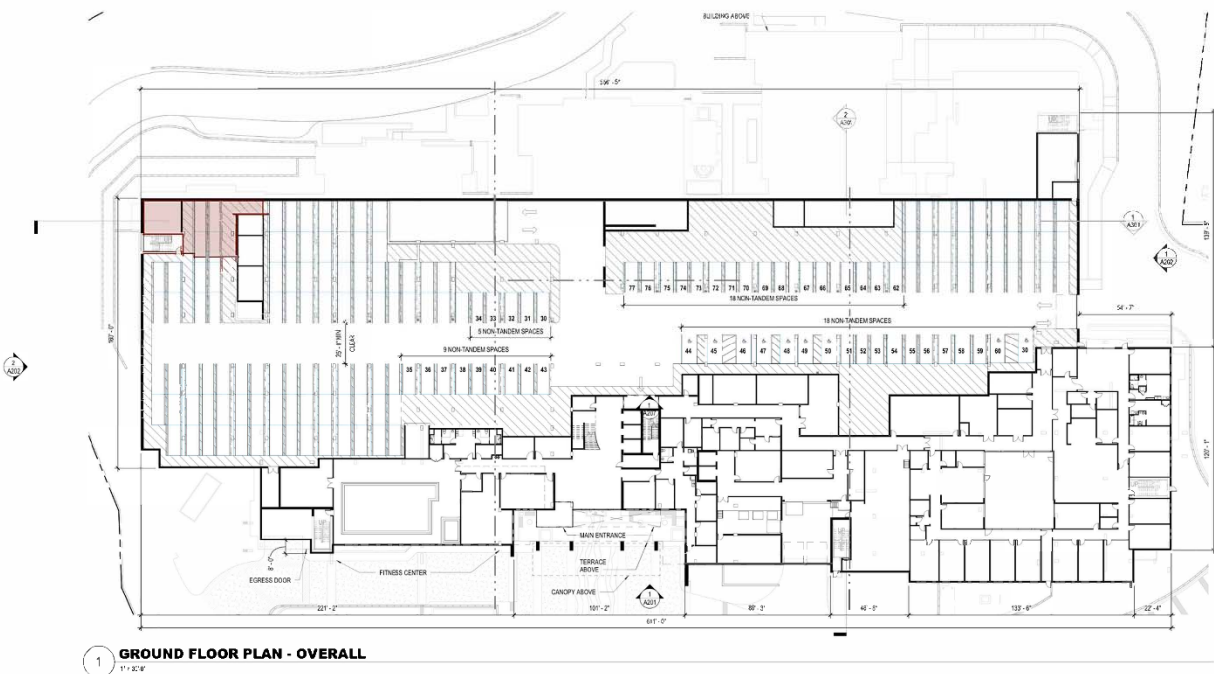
Ground Floor Garage Reduction | Revised Submittal
